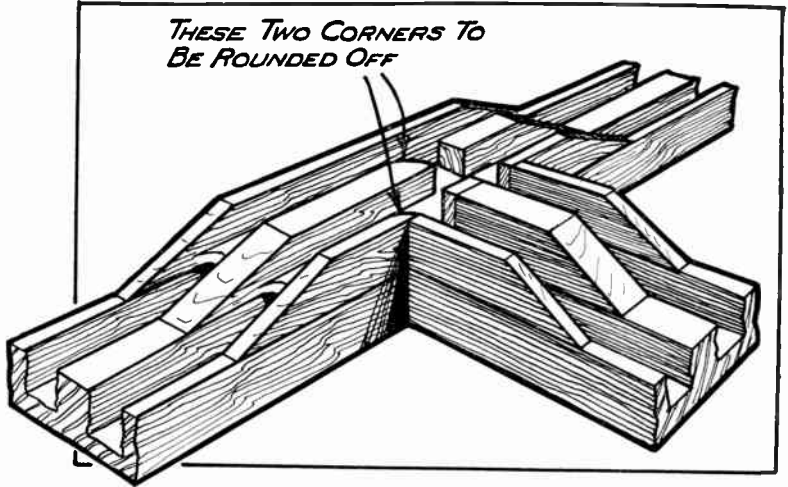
A T BRIDGE CROSSING WITH THE WOODEN CASING SYSTEM OF WIRING.
